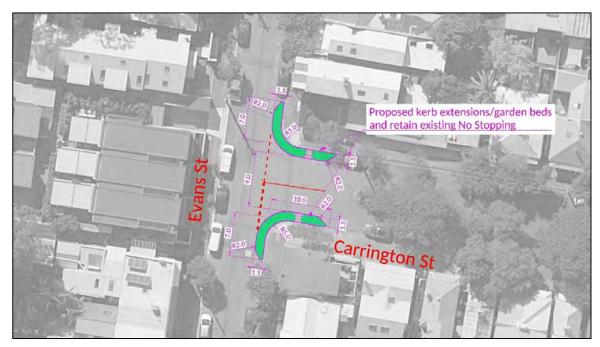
Evans Street / Carrington Street intersection proposal.
